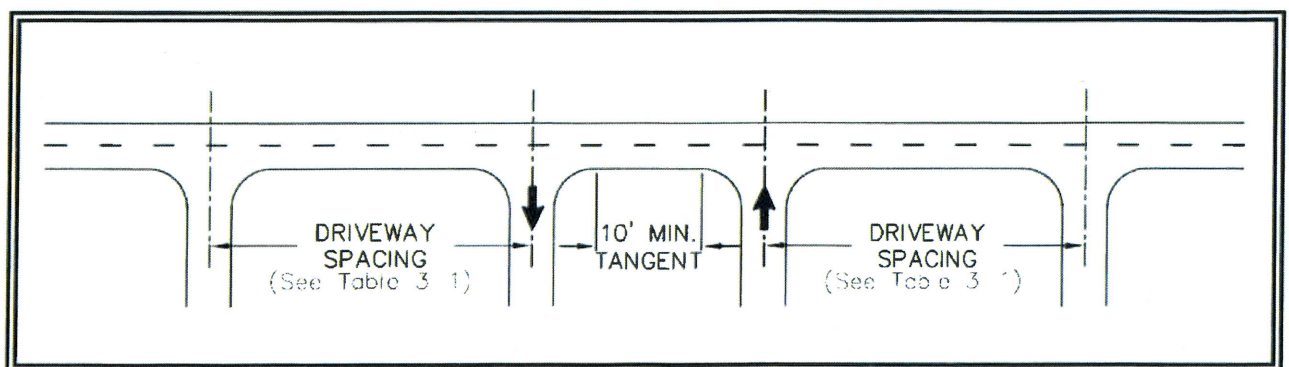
SPACING CRITERIA FOR ONE-WAY DRIVEWAYS
